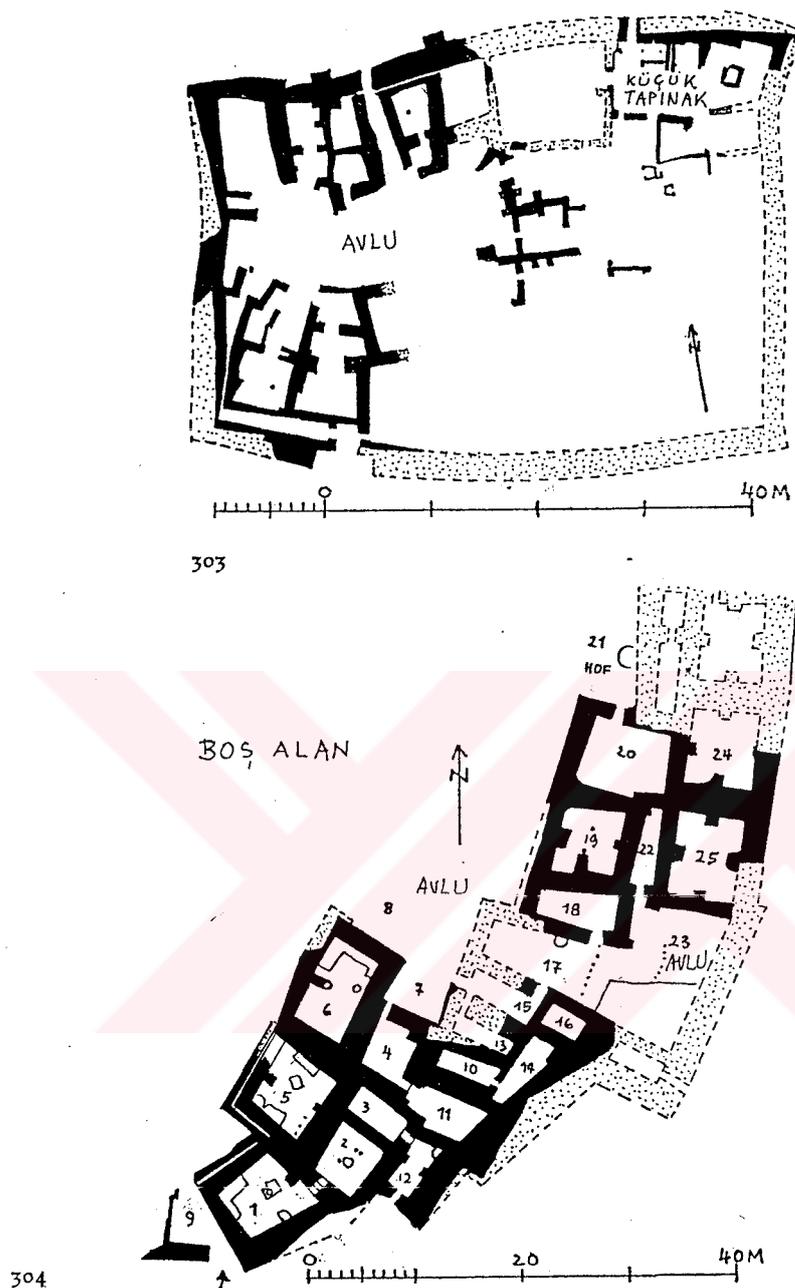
Hacilar: Defensive Wall by the Side Walls of Houses (Naumann, R., p. 246)
